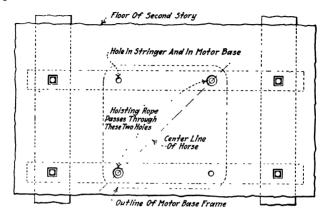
Plan view of second floor of hoisting arrangement shown in Fig. 143.
